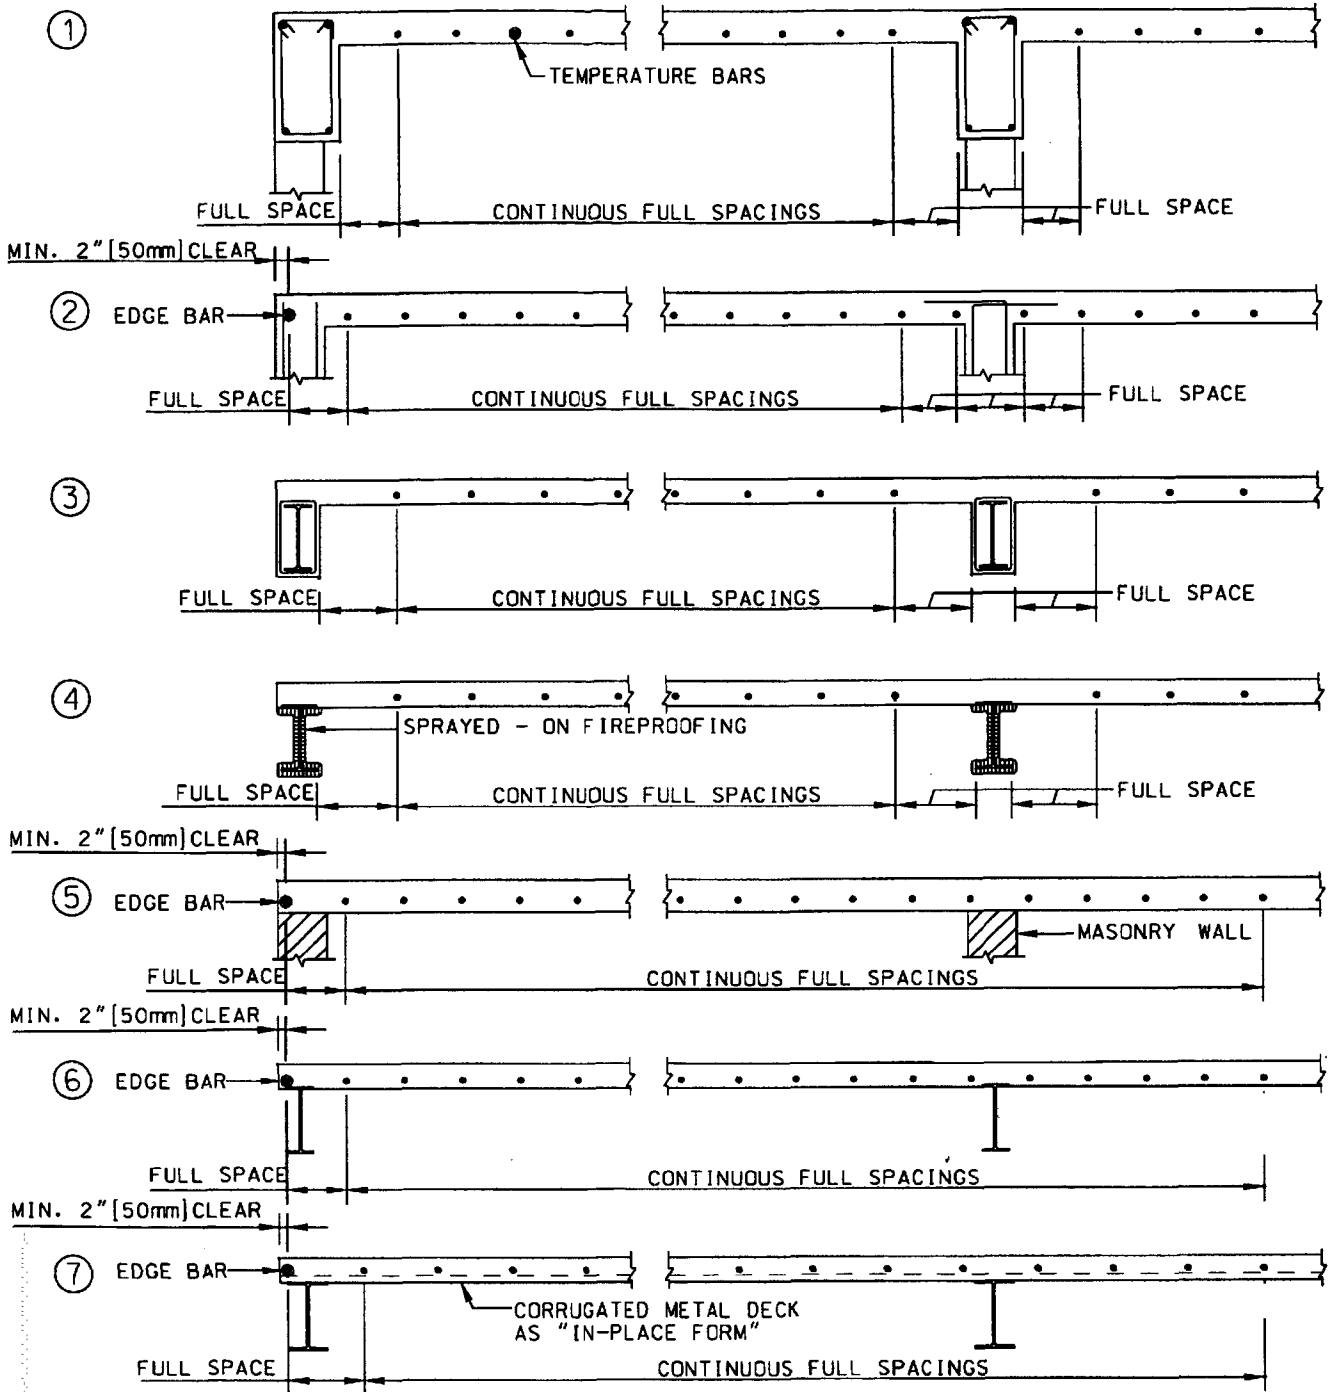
(b)—Location of first bar designated only by size and spacing, one-way slab shrinkage and temperature reinforcing bars.
